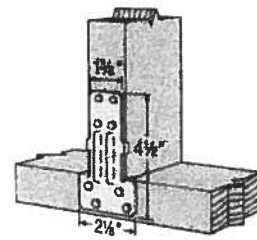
RSP4 INSTALLATION: STUD TO SILL PLATE
